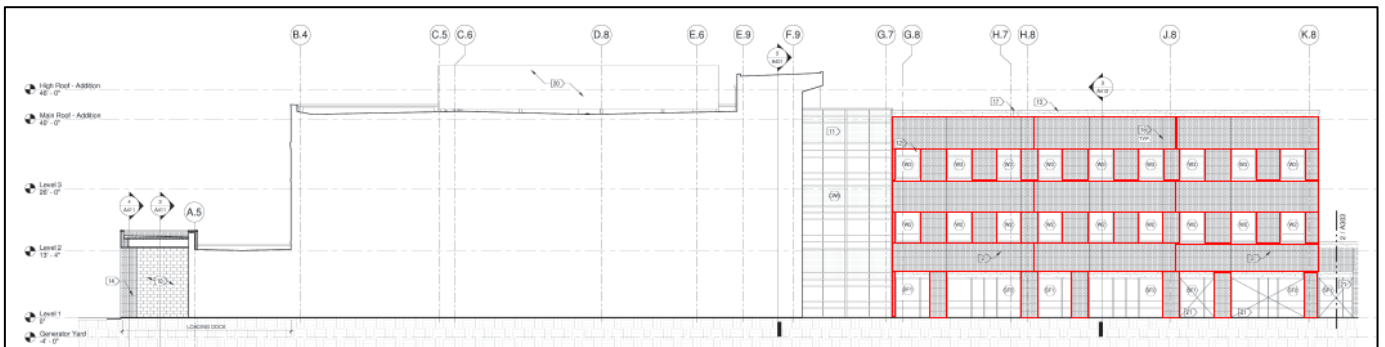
, North elevation - Storefront windows on the first floor did not permit use of vertical panels on this facade.
